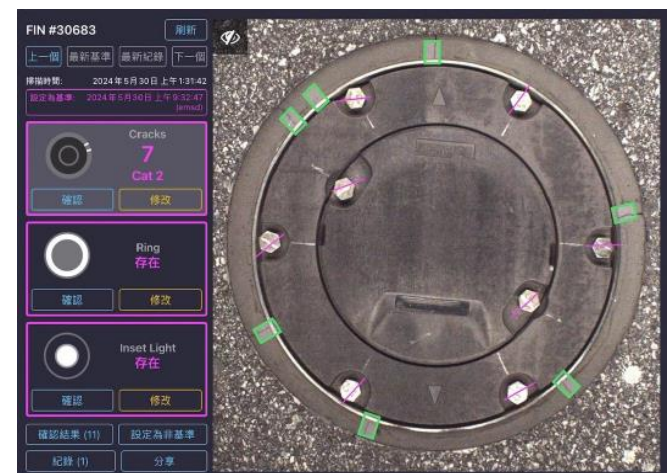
The Epoxy Cracks were highlighted in the Operator Mobile Device. The Severity of the Epoxy Cracks will be categorized into Cat 1, 2, or 3
